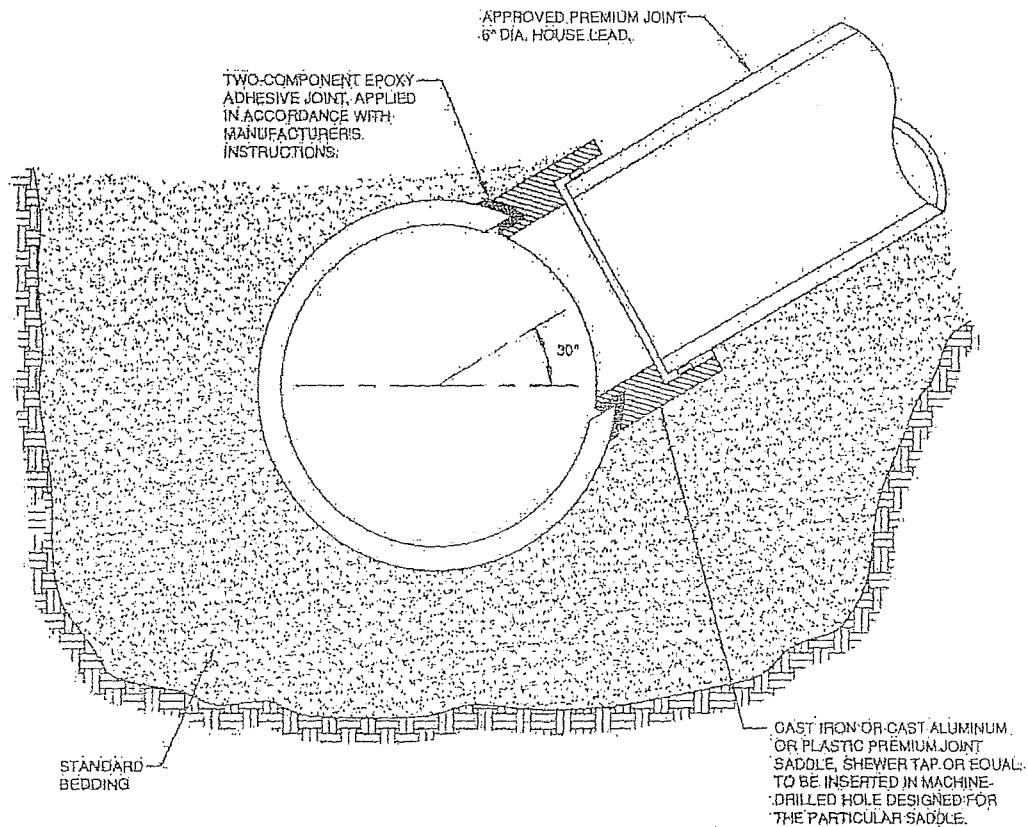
DETAILS OF HOUSE LEAD CONNECTIONS TO MAIN SEWER WHERE WYE OPENINGS ARE NOT PROVIDED
